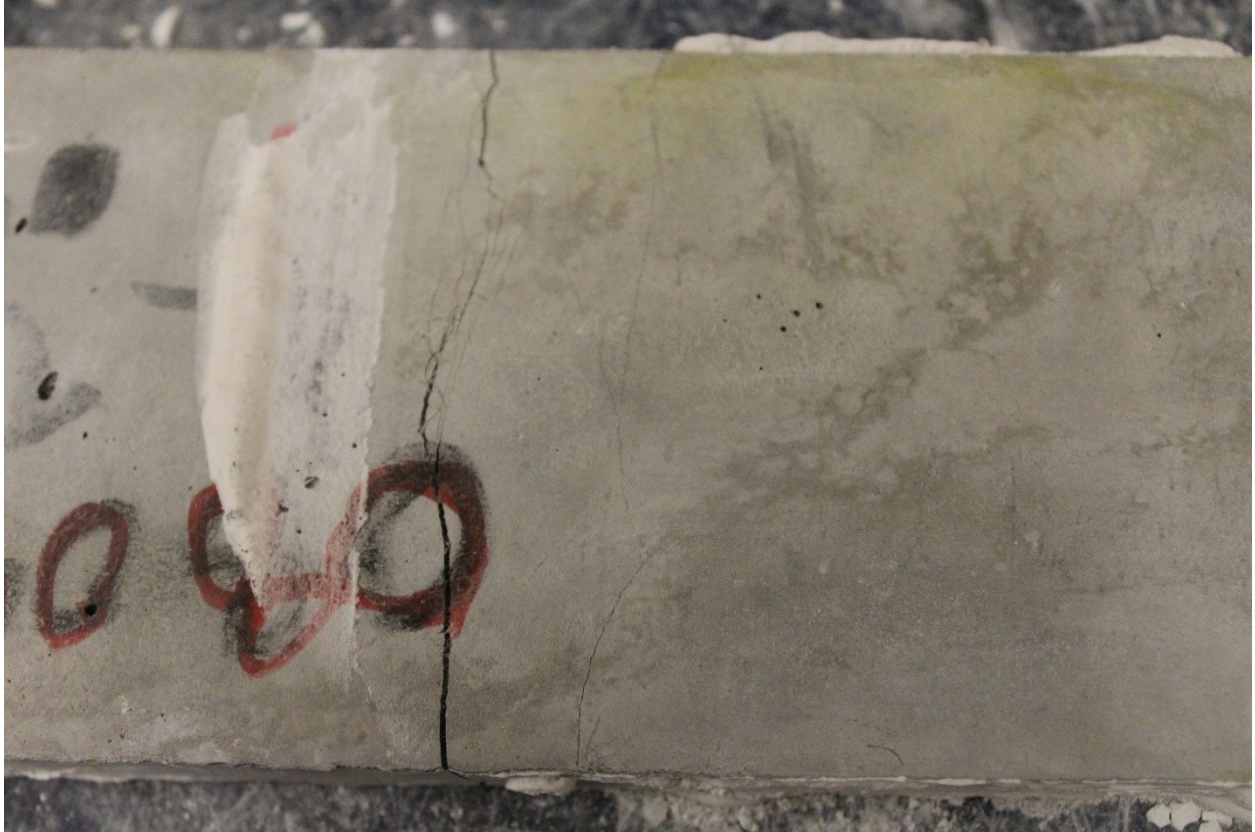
Tensile cracking on ECC06 coupon specimen
